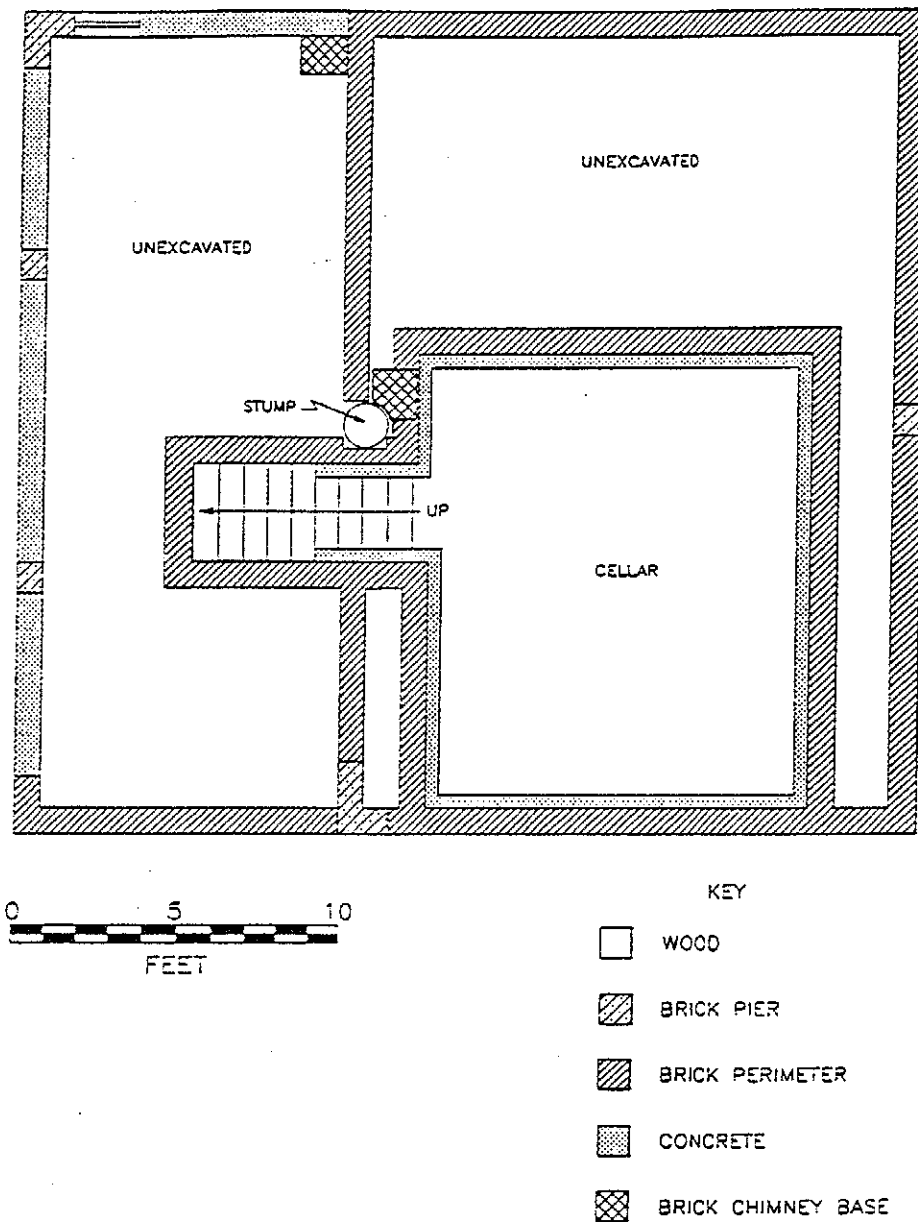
Basement and foundation plan of Kiel house, 1994. Drawn by F. Mansberger.
